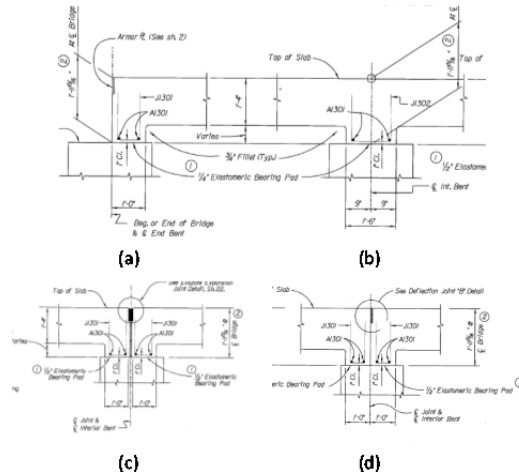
Typical Slab Details Used in Flat Slab Bridges
